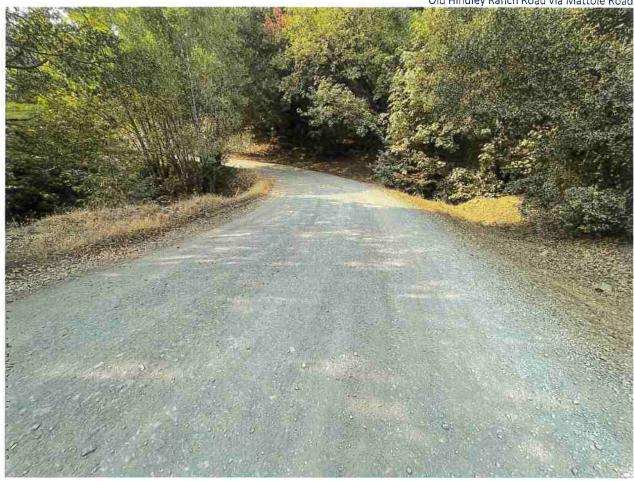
Second bend on Old Hindley Ranch Road with ample visibility, facing towards Mattole Road (Road Width = ± 20 feet).
